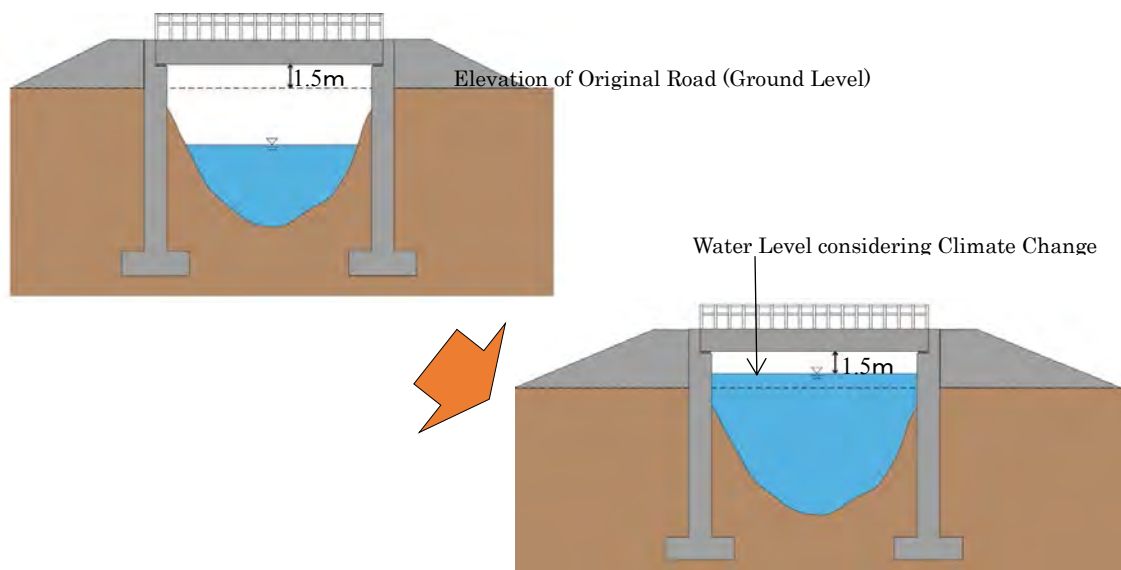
CCA Measures for Construction of Bridges under the Project
